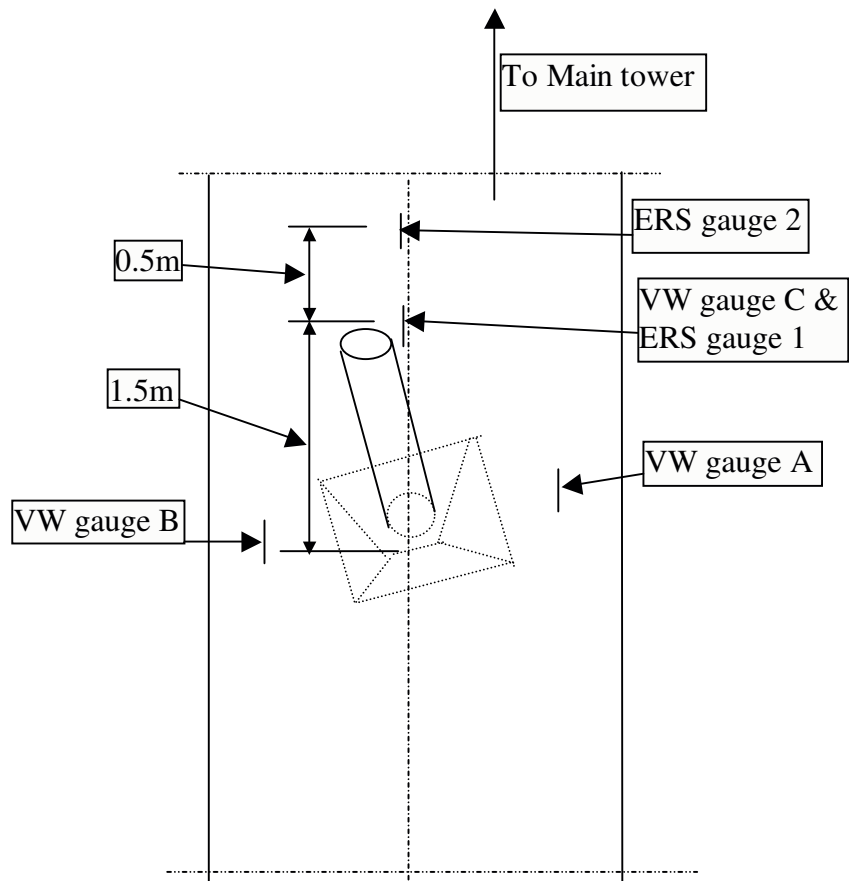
Plan view of the edge beam with VW and ERS gauges at anchorage stay pocket
